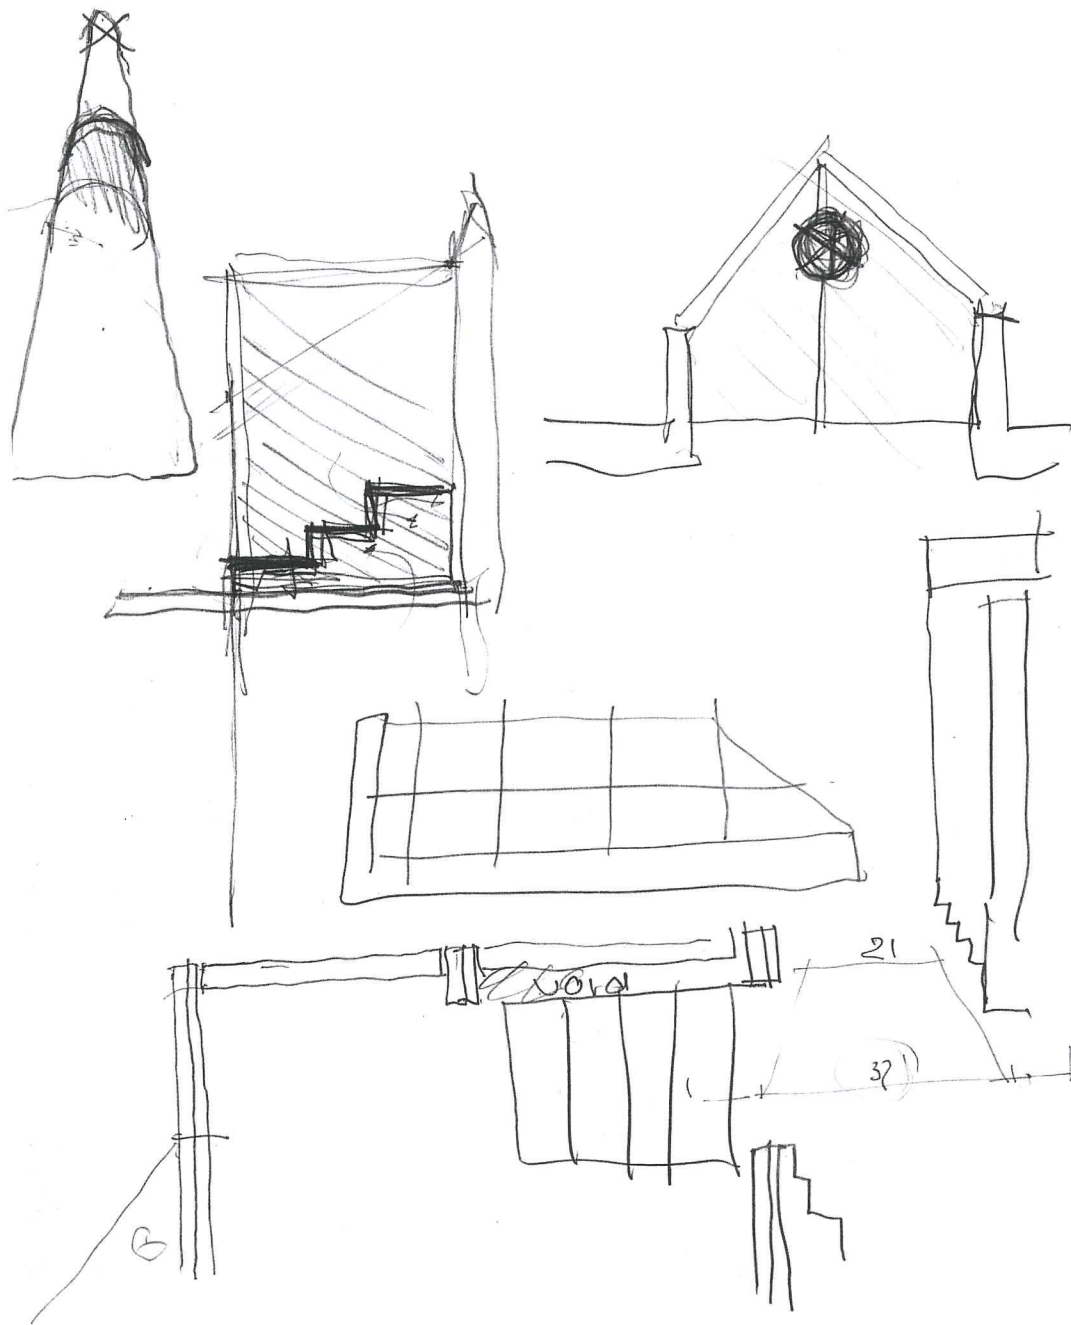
Master's Apartment in the House of 1925, Initial Sketches of Skylight, Stair and Handrail Details
